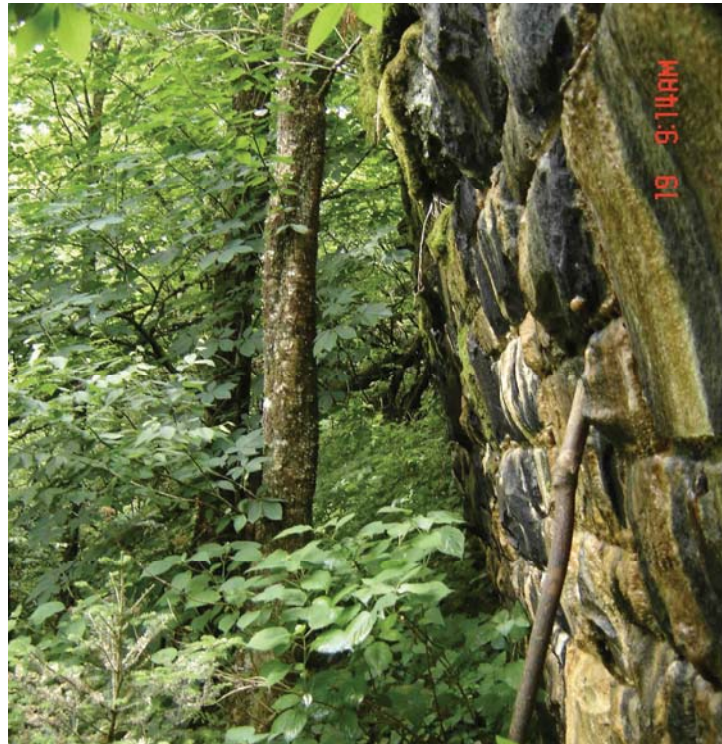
Photo. Overturning mortared stone masonry wall at Great Smoky Mountains National Park (assessment of primary/secondary elements alone would miss this obvious pending failure).
